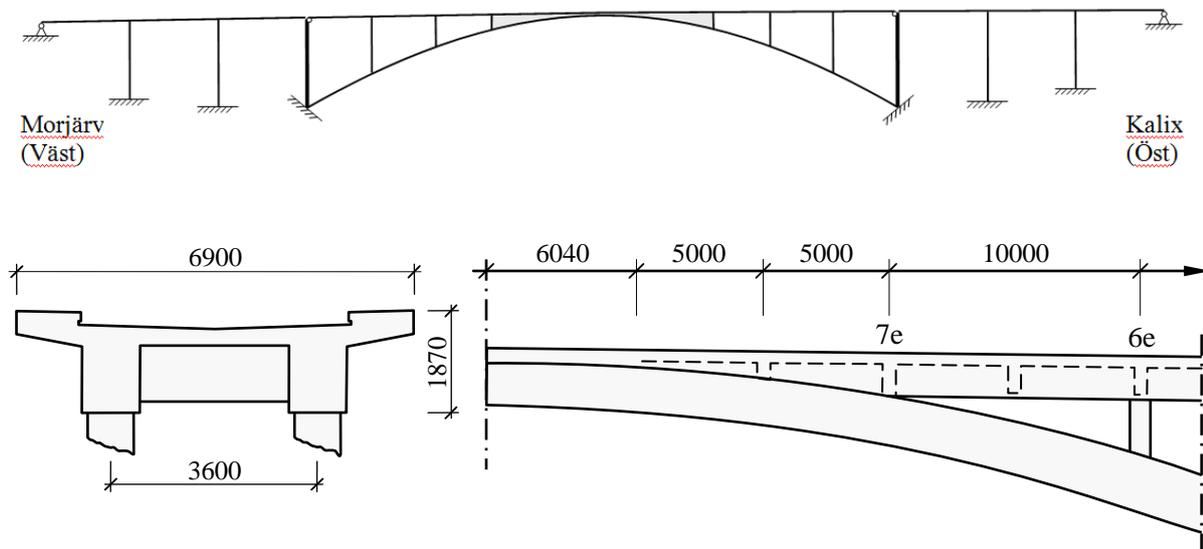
The Railway Concrete Arch Bridge over Kalix River at Långforsen.
